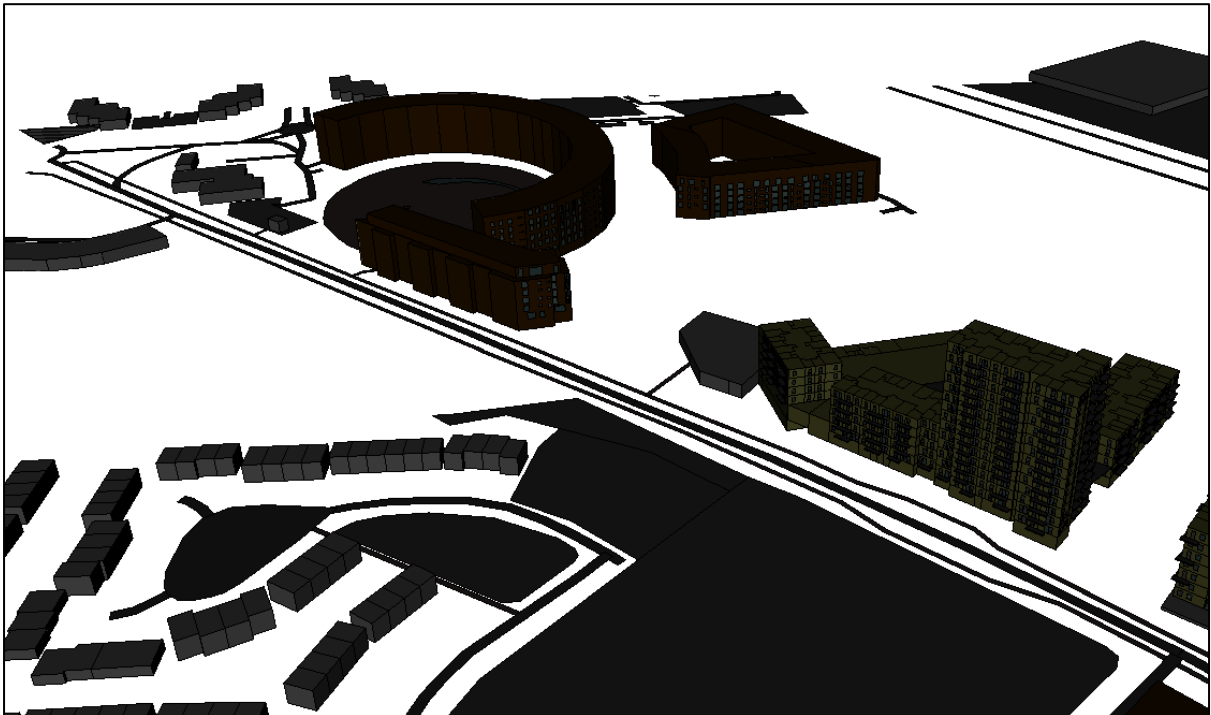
Shadow image on December 21<sup>st</sup> at 08:00 of Park West with Proposed Development (modelling software)
